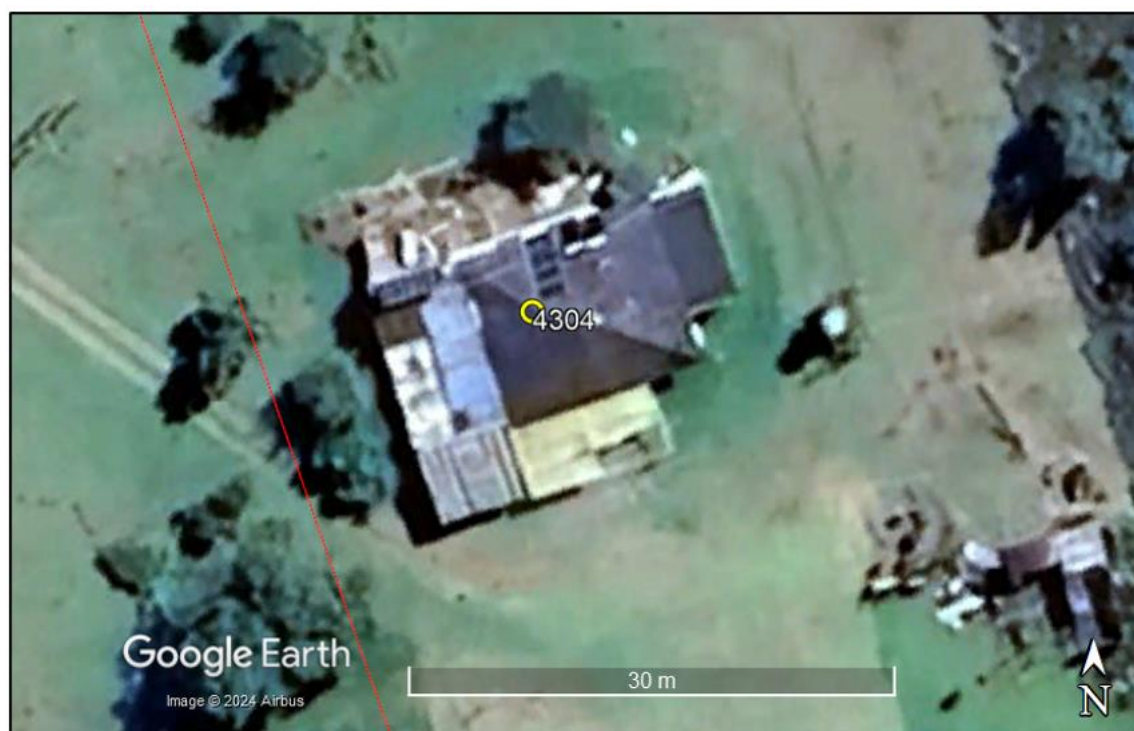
Aerial view showing the many additions to the house at waypoint 4304
